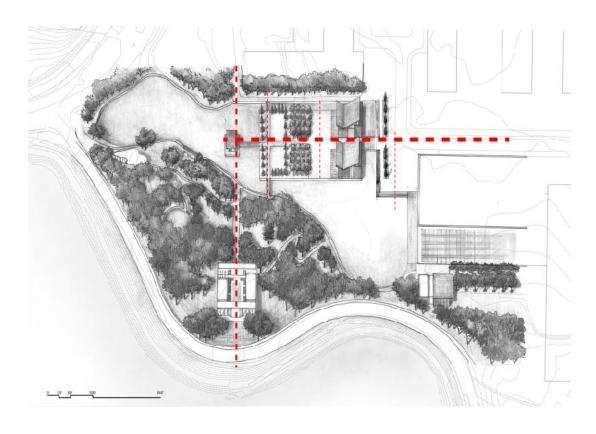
Site Plan - Axis Diagram (Source: Author)
